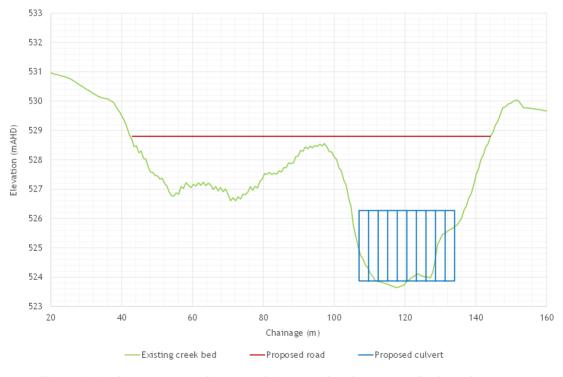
Cross-section of proposed Lawsons Creek crossing (looking downstream)
